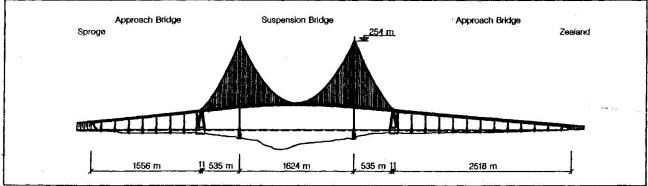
Longitudinal section of the Storebælt East Bridge (exaggerated vertical scale)
